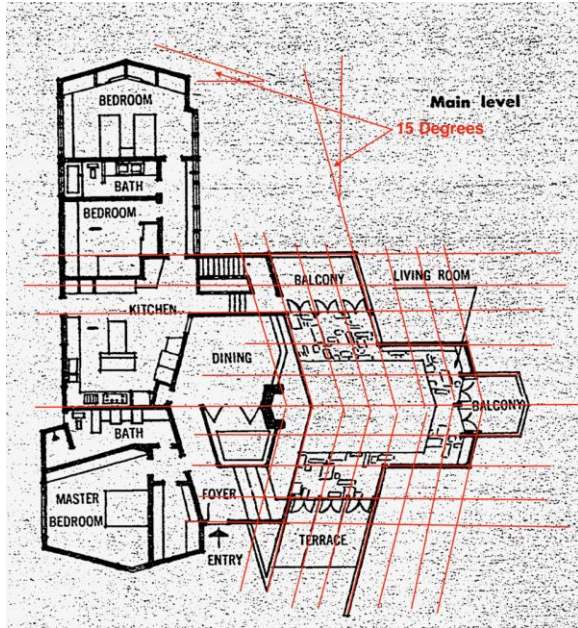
Plan of a hexagonal Usonian, the Sidney Bazett House (Frank Lloyd Wright, 1940)
